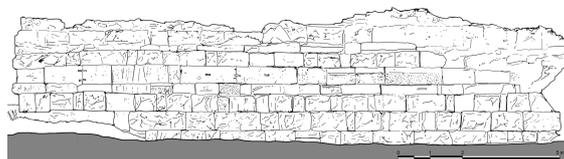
Boundary wall with reuse architectural blocks. Vectorial drawing (Cornieti 2008)
